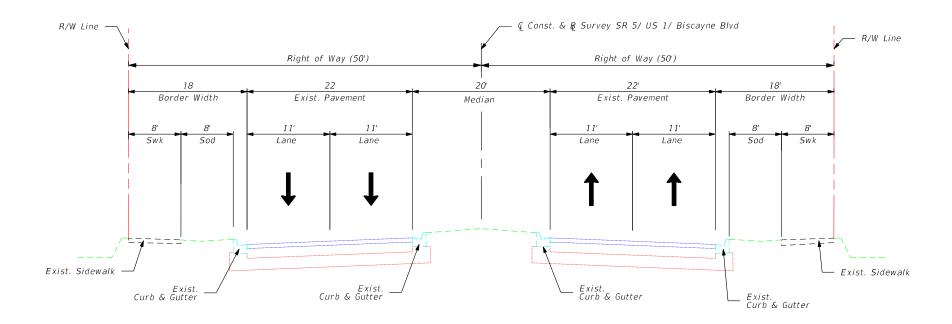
Existing Typical Section from NE 92nd Street to NE 105th Street
